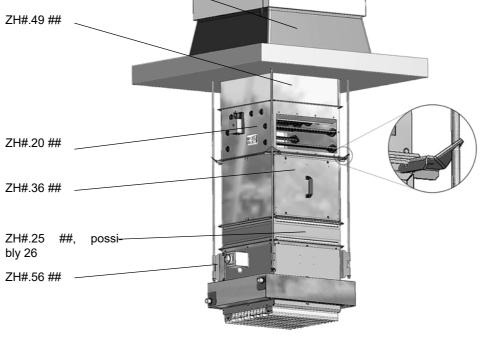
Ceiling mounting of the mixed air unit with suspension "Ceiling" (ZH#.560#)
